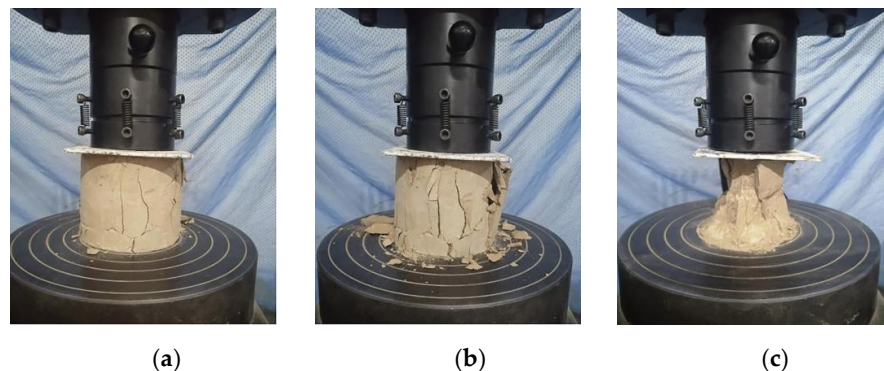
Test typical mode of failure in an uniaxial compression for cylindrical specimen: (a) middle stage of loading; (b) load to peak load; and (c) failure stage.
